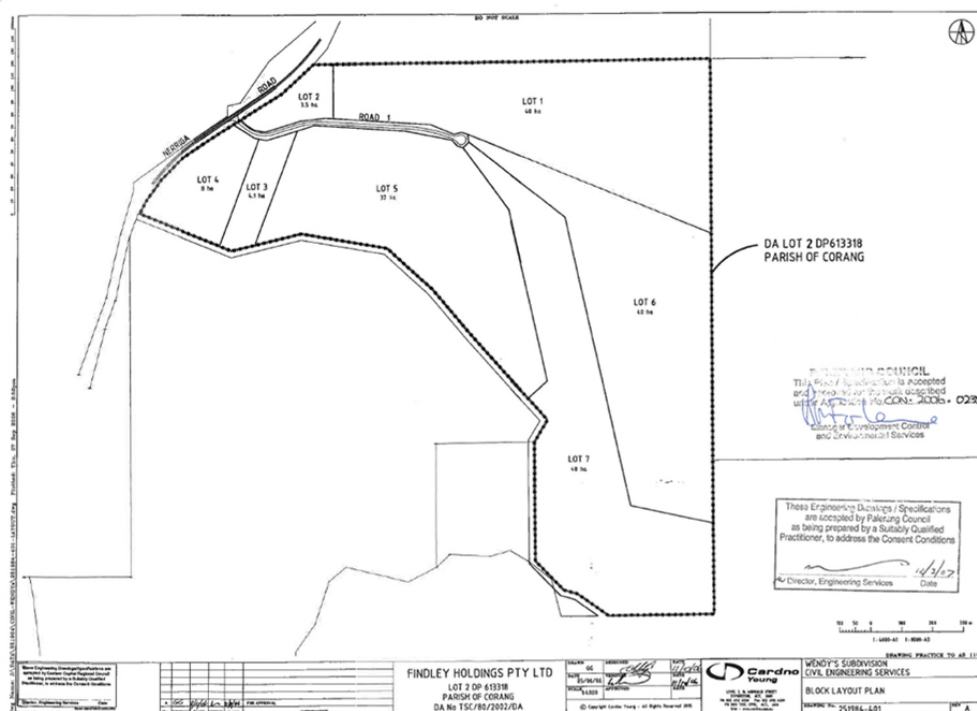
Approved Subdivision Plan (TSC/80/2002/DA)
